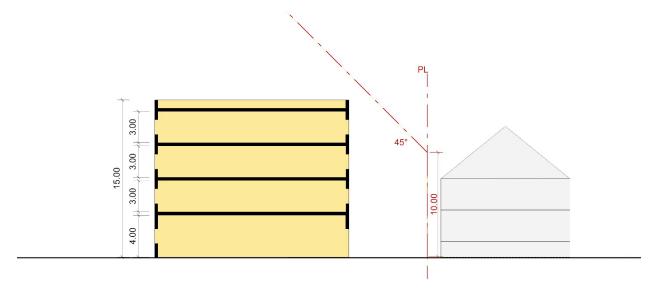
45-degree angular plane measured from 10.0 metres above grade. Buildings up to 15.0 metres in height are permitted to penetrate the angular plane, however this would only occur with atypically small setbacks.
